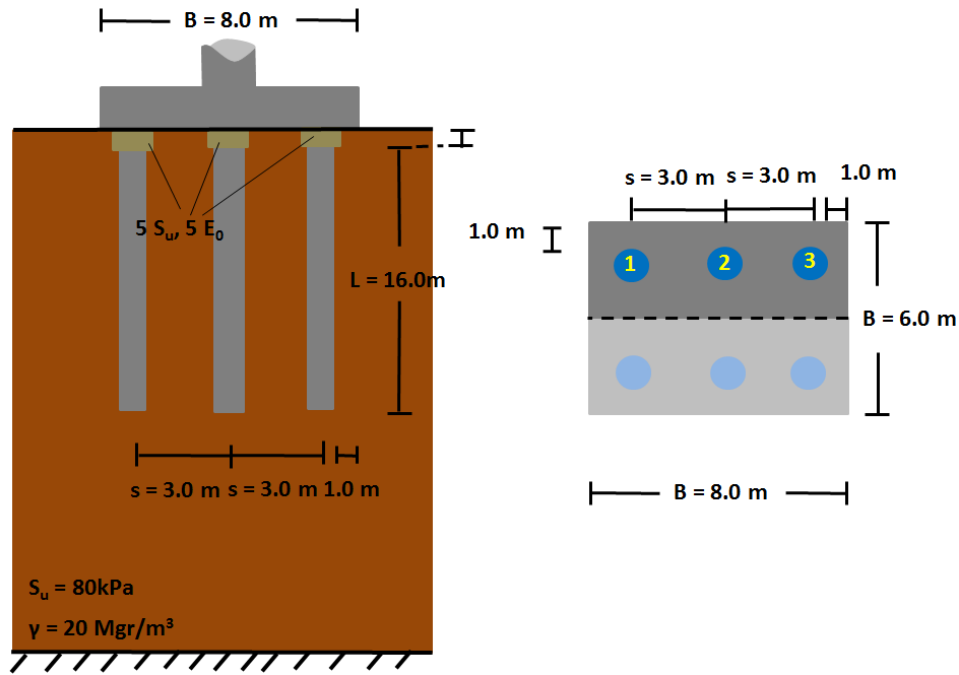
Design of the conventional unconnected pile foundation (UC). Section and plan view.
